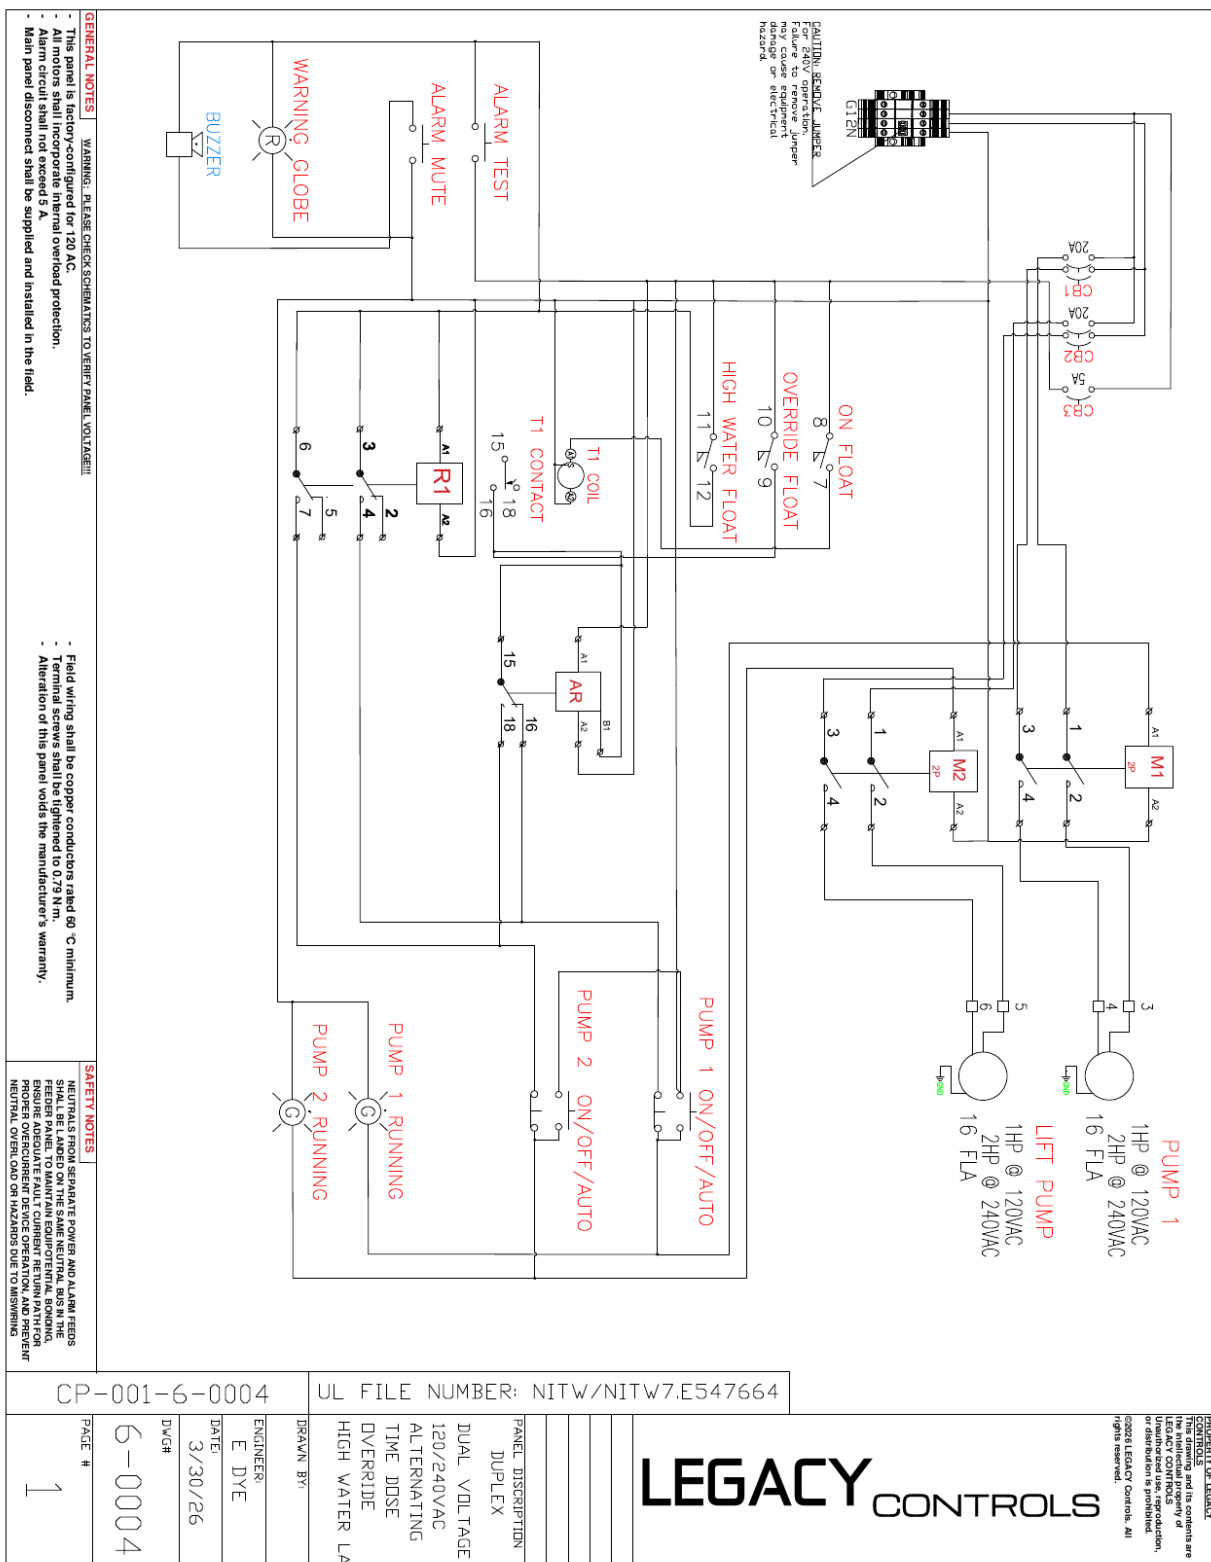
LINE DRAWING v1.1 (REFERENCE)
